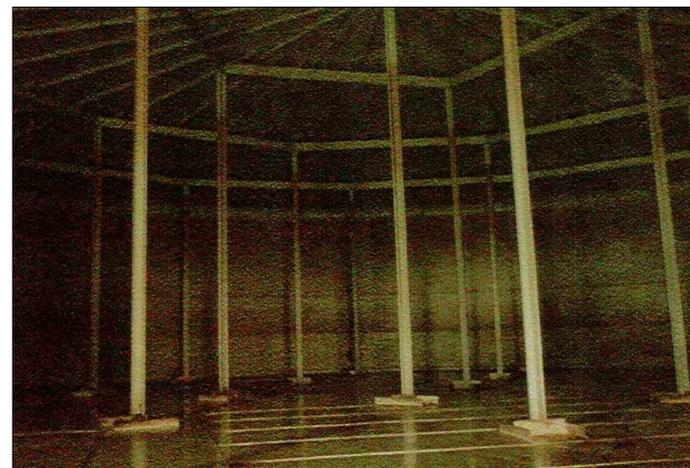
All rafter surfaces exhibiting rust shall be cleaned and re-coated as specified.
